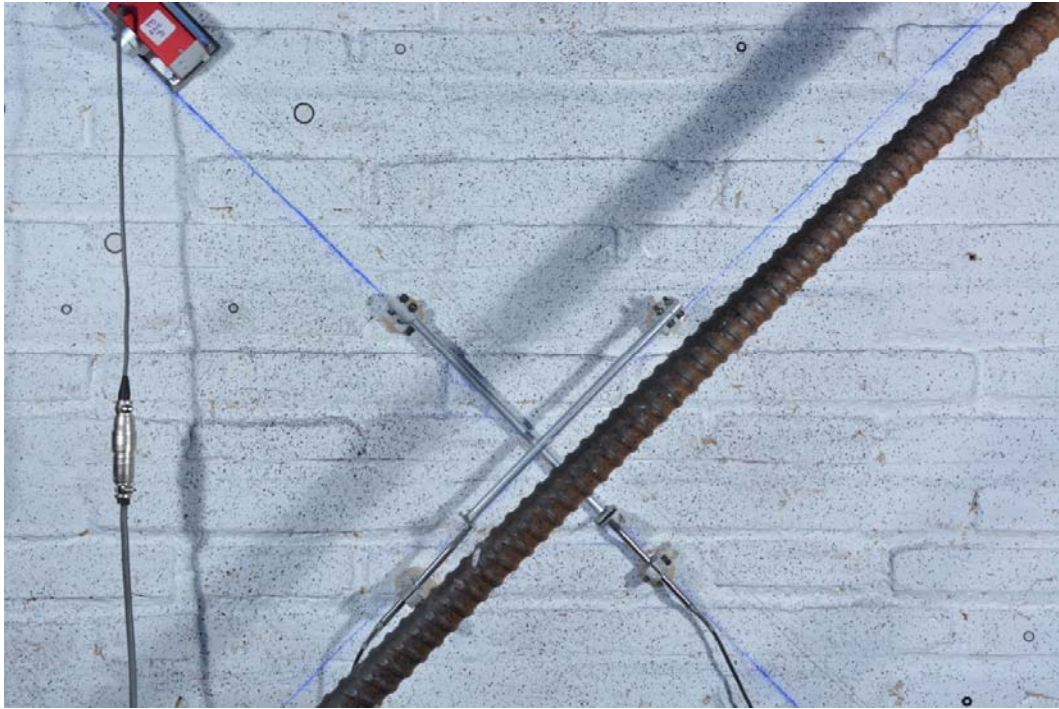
Surface of masonry wall with speckled pattern (courtesy of García Ramonda)
